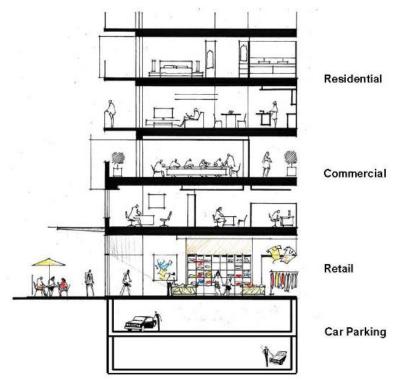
Example of a Common Layout for Vertical Mixed-use Buildings
